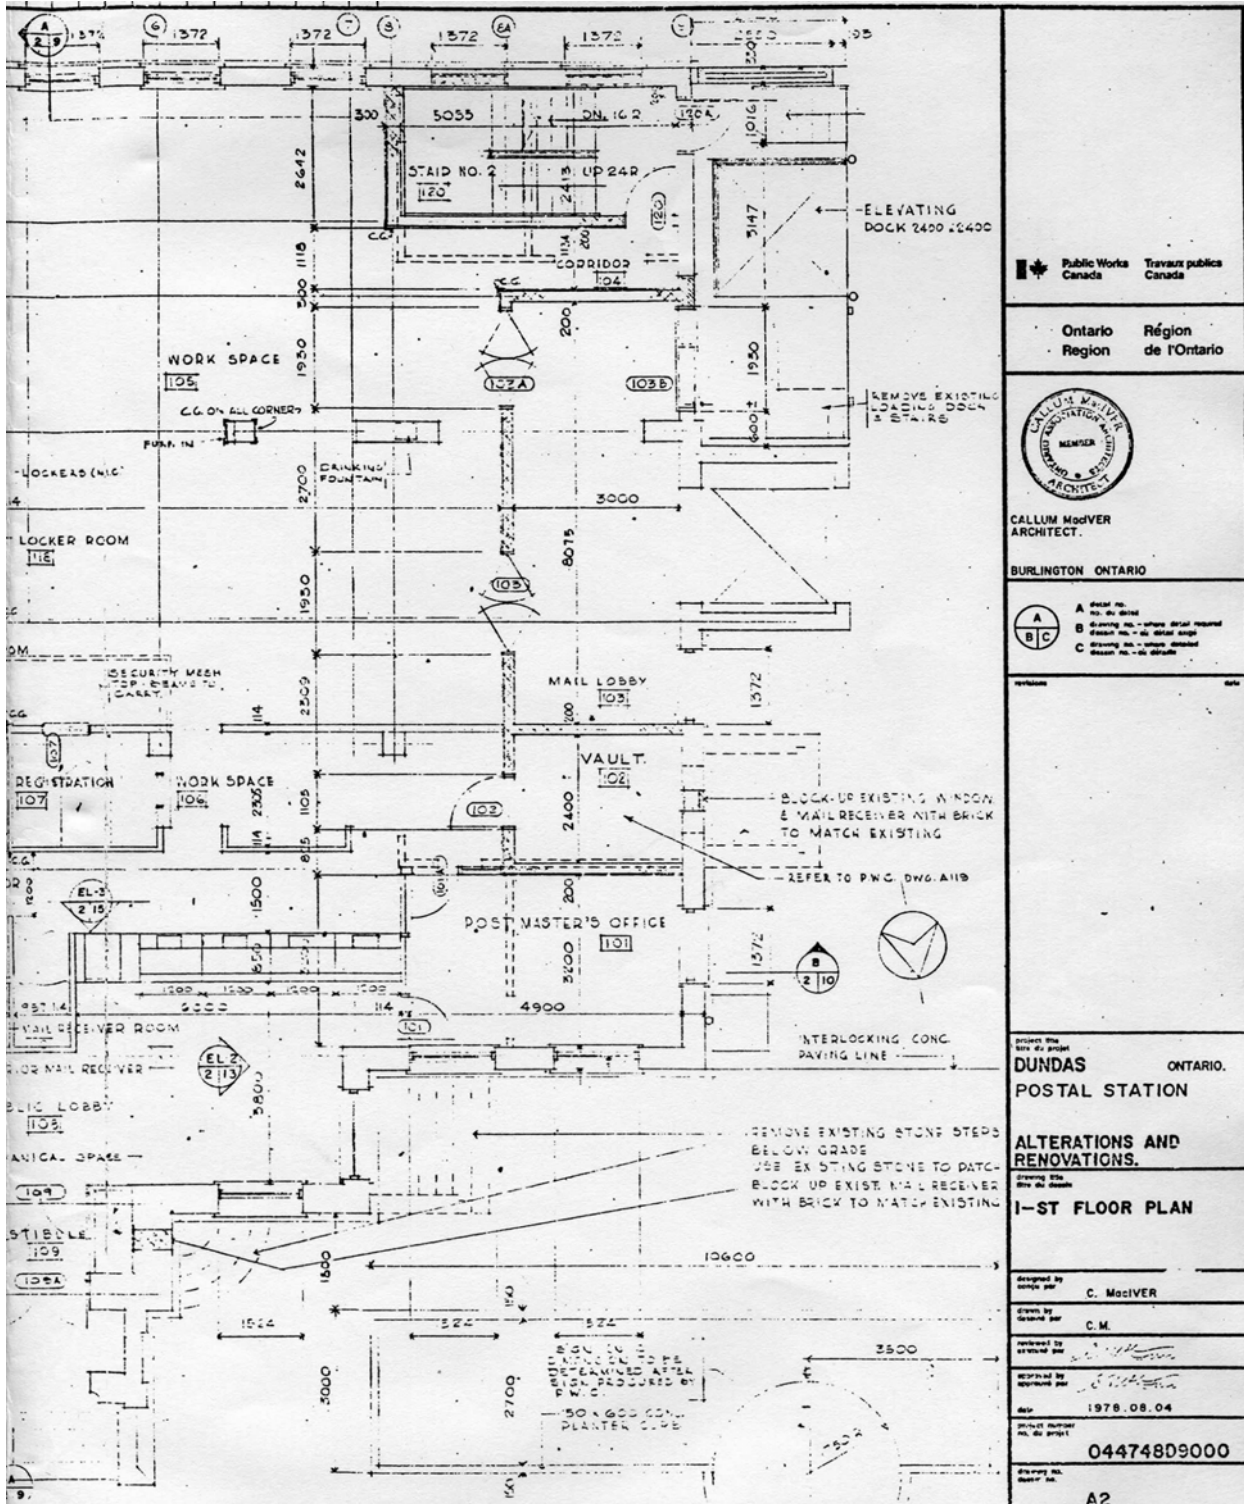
Drawing No. A2: West half of ground floor plan from the 1978 set of drawings for proposed renovations and additions, showing the new rear stairwell, the Vault and Mail Lobby (all with concrete block partition walls), the reconfiguration of the Postmaster's Office, and the new counter on its east side. Also shows alterations to the loading dock area, with its new loading dock doorway and new staff entrance through a doorway onto the first floor landing of the new stairwell.
